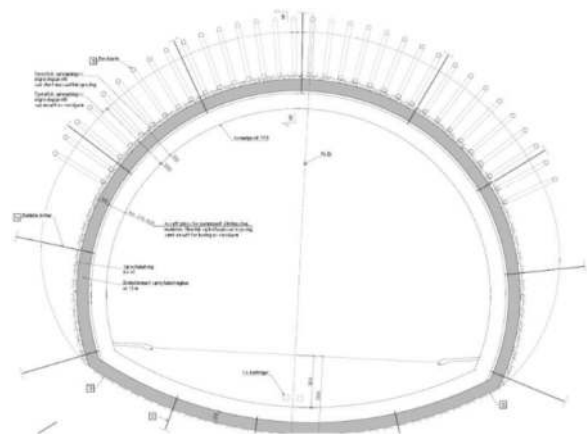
Basic design of tunnel cross-section with pipe umbrellas. The sprayed concrete ribs are around the tunnel cross-section including the floor.
